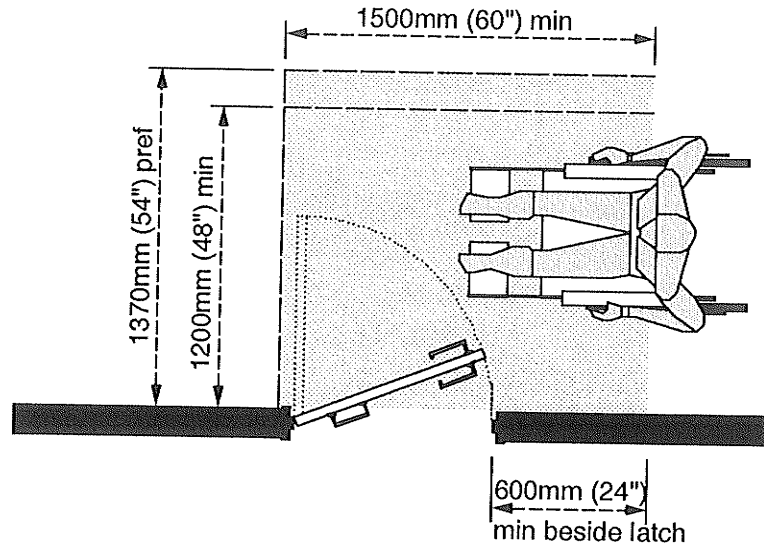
Minimum Doorway Maneuvering Space, Side-hinged Door, Latch Side Approach, Pull Side
